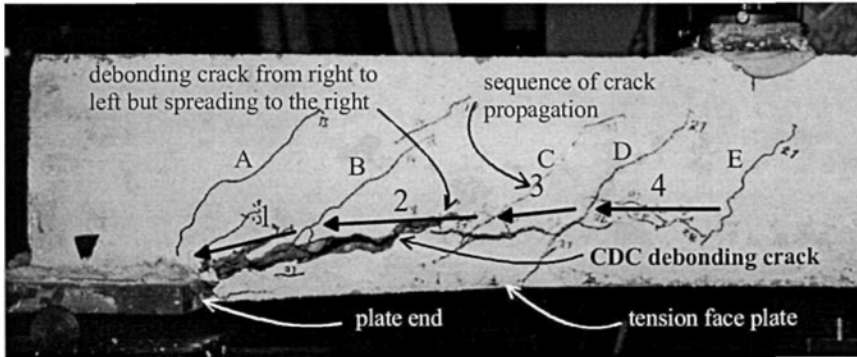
CDC debonding of a tension face plated beam with stirrups
